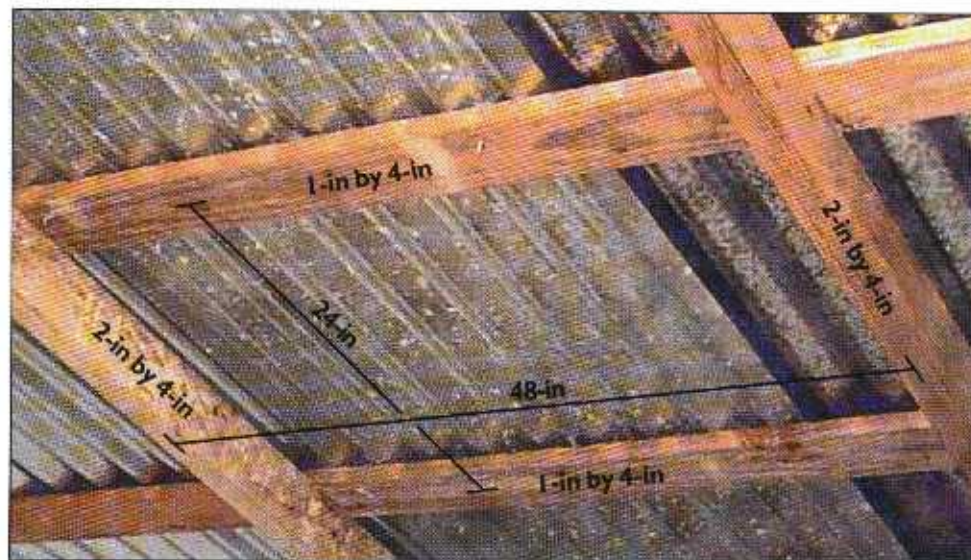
Typical wooden roof structure with metal roof panels above. Nails connected the metal panels to the nailers and the nailers were nailed to the joists.
